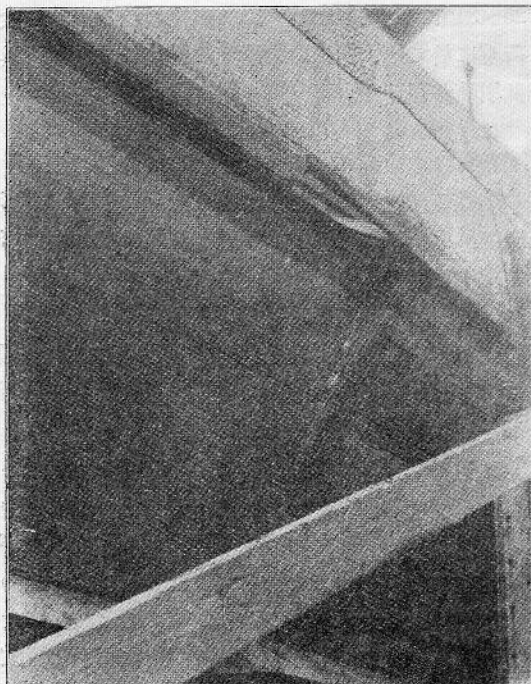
Hogging Test. Showing General Buckling of Starboard Side, Frames 99-103.
